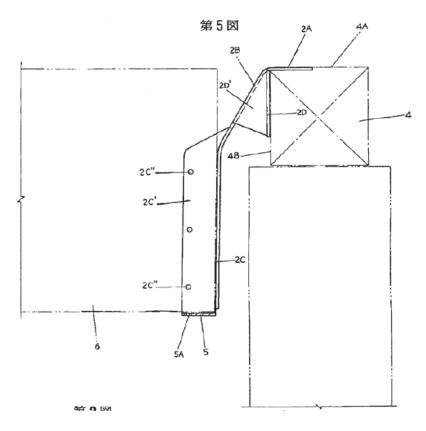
of Tsukamoto is a cross-sectional view of a beam hanger connecting a beam to a wall.
